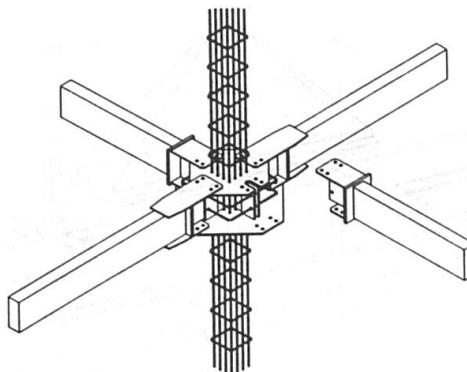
Composite subsystem composed by RC columns and steel beams for a MRF scheme (Carannante Joints, 1995).
